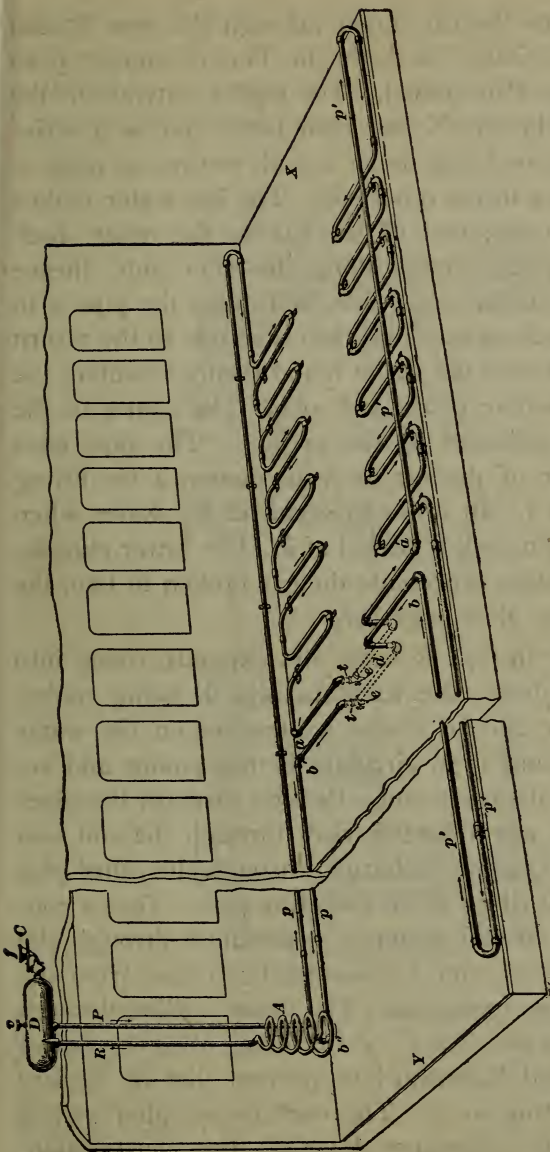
SHOWING PLAN OF PIPING, COIL, AND CIRCULATION DRUM.
